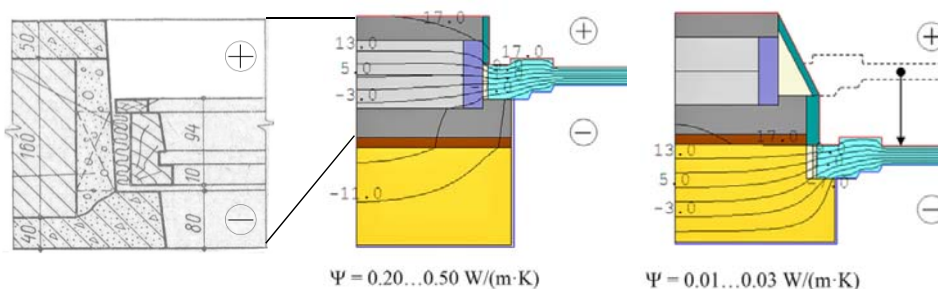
An original design drawing of an external concrete wall/window junction (left) with examples of bad practice (middle) and best practice with windows positioned in the plane of additional thermal insulation (right).
